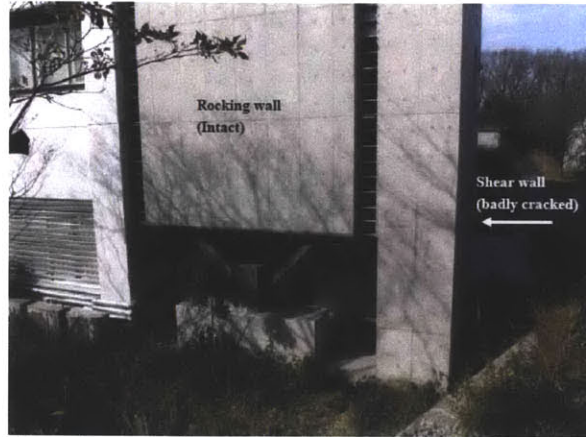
The rocking wall under consideration, adjacent to the static shear wall that sustained damage (courtesy Dr. Z. Qu, March 15th 2011)
